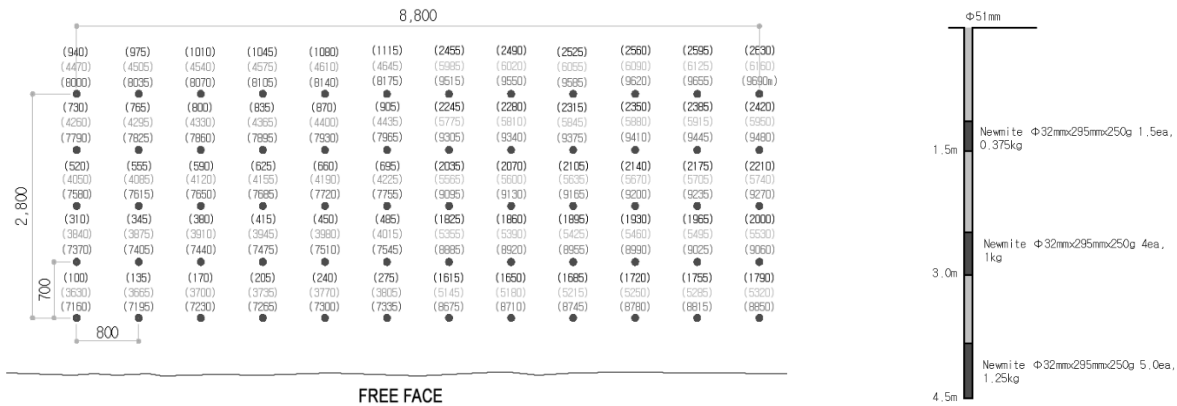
Blasting pattern of horizontal deck-charge blasting method (60 holes)
